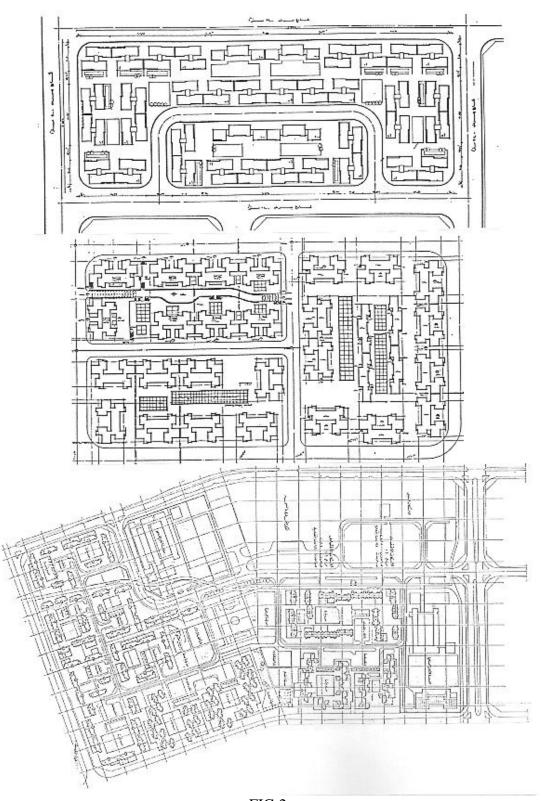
Typical Walk-ups' site plans; Settlement No.3, at Khatamiya (14.a &14.b) and New Ameriyah City (13), Egypt.
